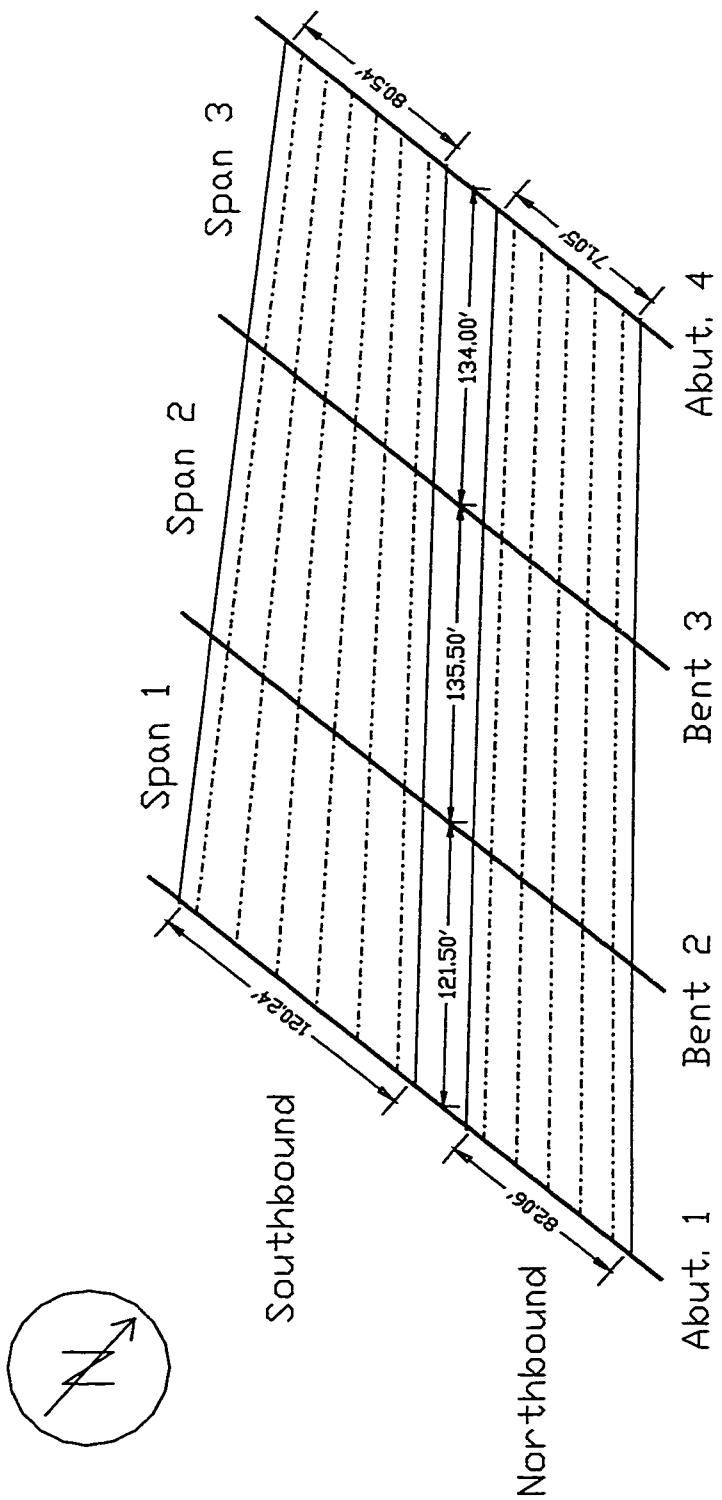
Site of the Louetta Road Overpass in Northwest Houston, TX
